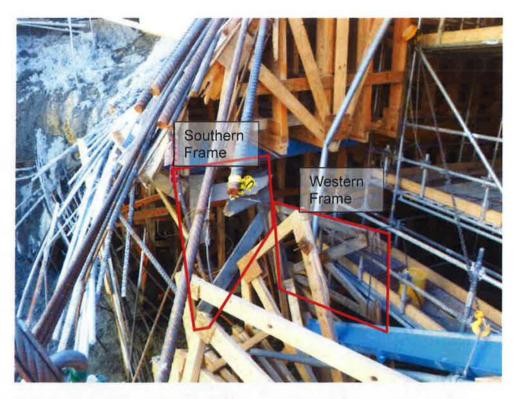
Shoring Tower C4, southern frame and western frame. Tower members outlined in red.
